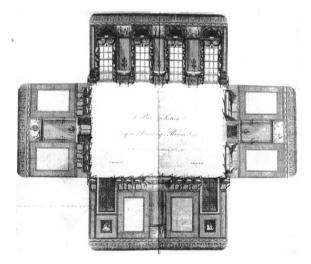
Thomas Sheraton. A plan and section of a drawing room, 1793
